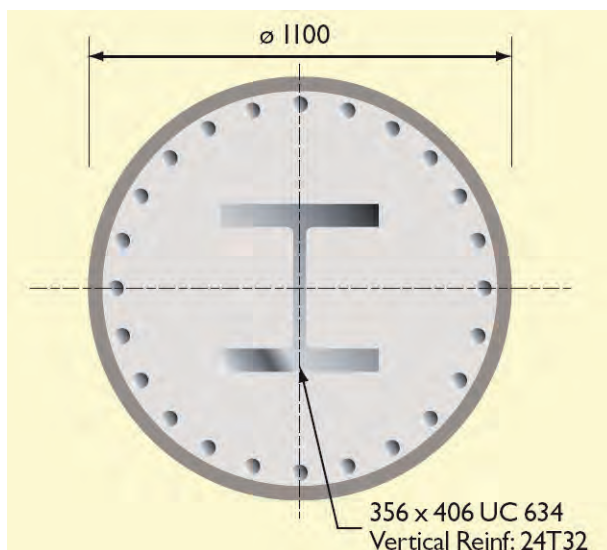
Cross section through a typical composite column (dimensions in mm)
